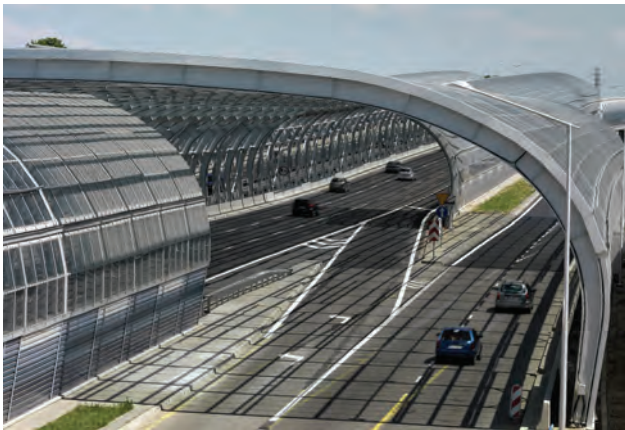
View of one of the section of half-tunnel noise barriers [14]
